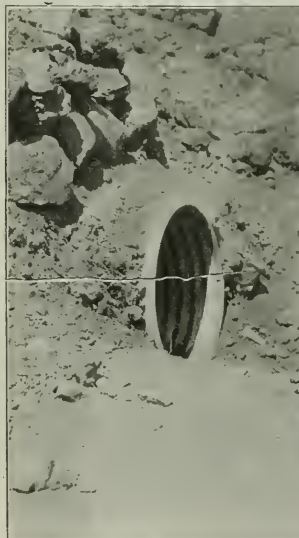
A 24-in. Corrugated Iron Culvert Pipe Under an Earth Fill on the Northwestern Pacific
